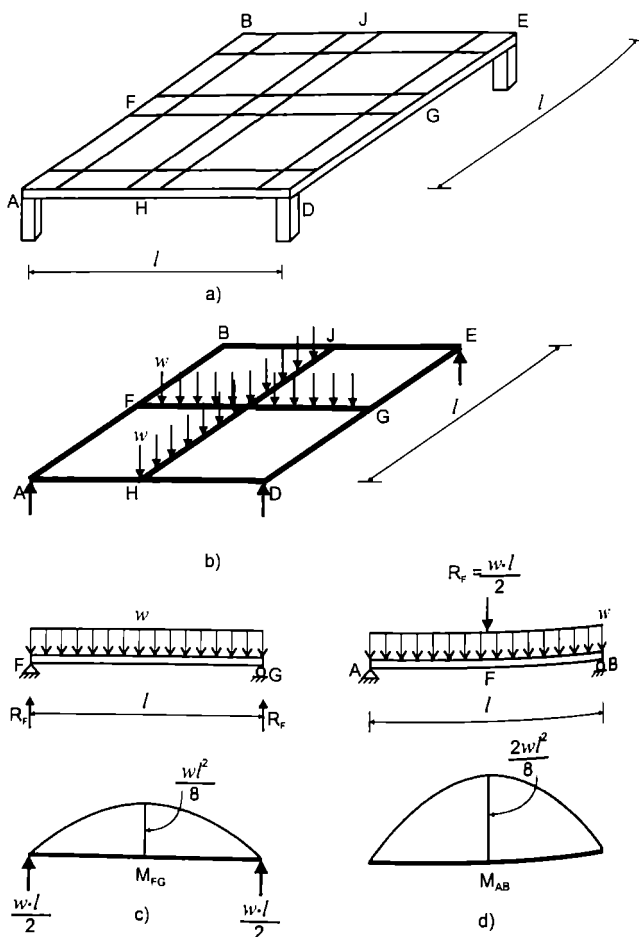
Flat plate/slab modelled as a beam grid:
